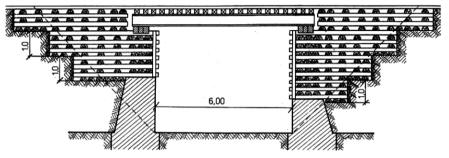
Provisional reconstruction of a bridge with a span made of I-beams on supports (abutments) made of railway sleepers forming so-called cages (Cholewo & Sznurowski, 1970; Miklin & Sawicki, 1993)
